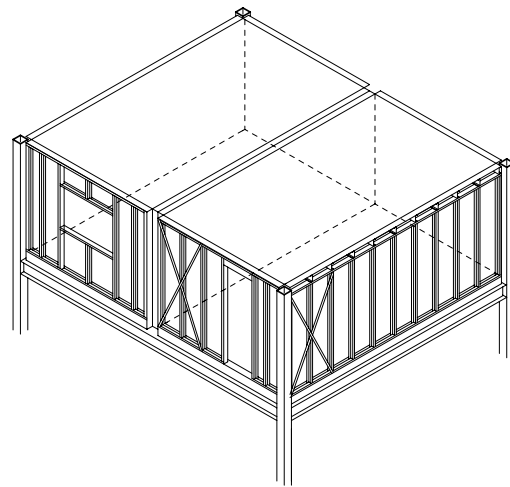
Recessed corner modules supported by a steel structure at each floor level
